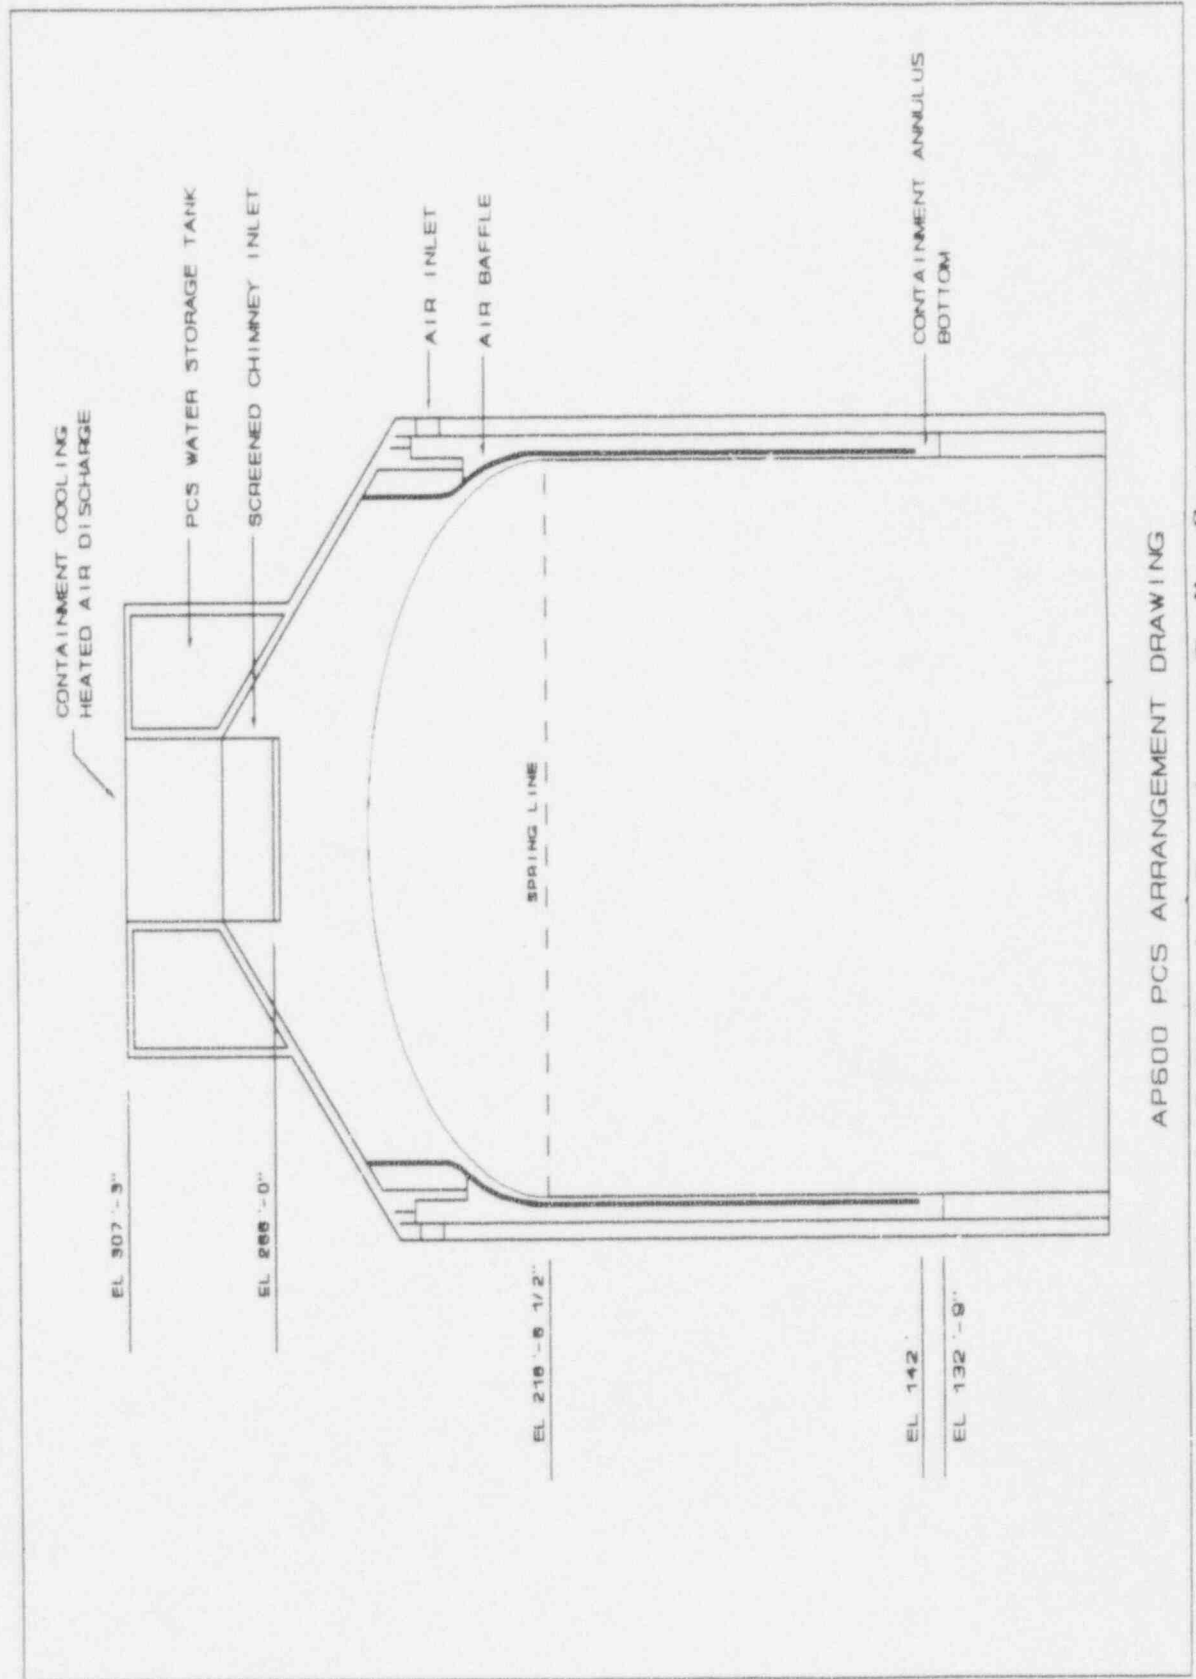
Schematic Drawing of AP600 Passive Containment Cooling System
